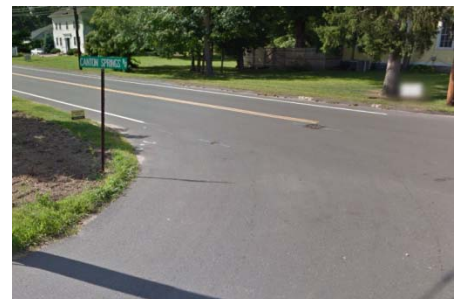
Lack of Crossing From Canton Town Green Road To Canton Springs Road
